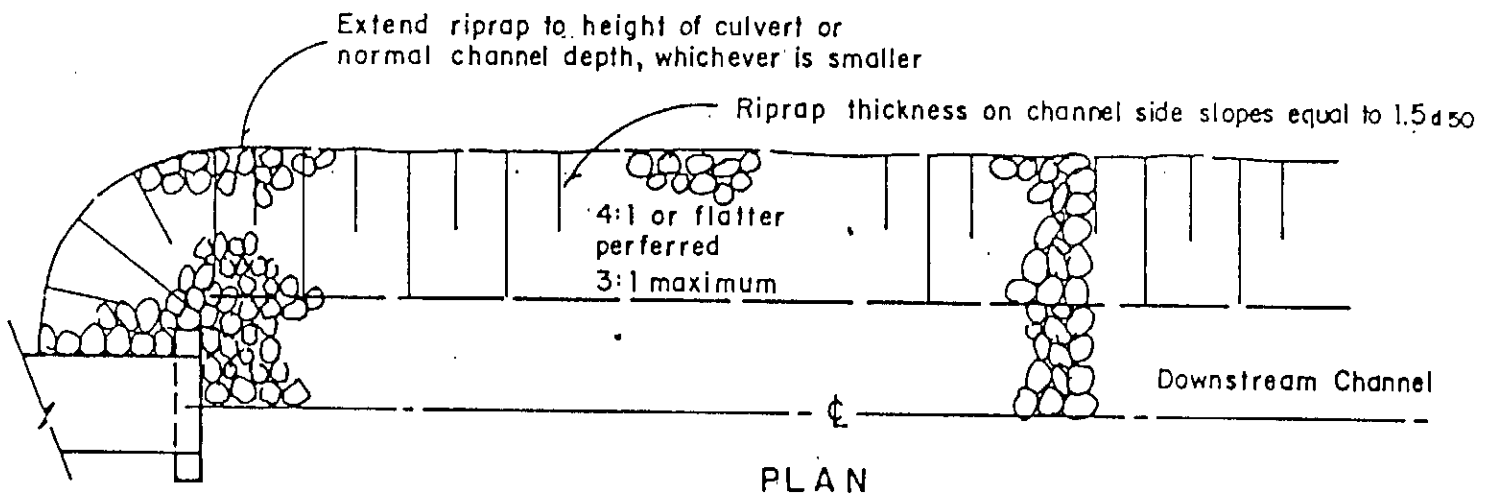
CONDUIT OUTLET EROSION PROTECTION
